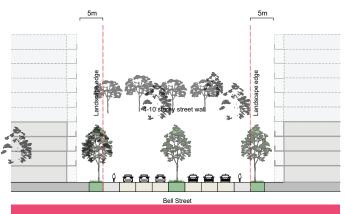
Bell Street, Bell Street Precinct. A 5m ground floor setback is proposed to manage amenity on this major road.
